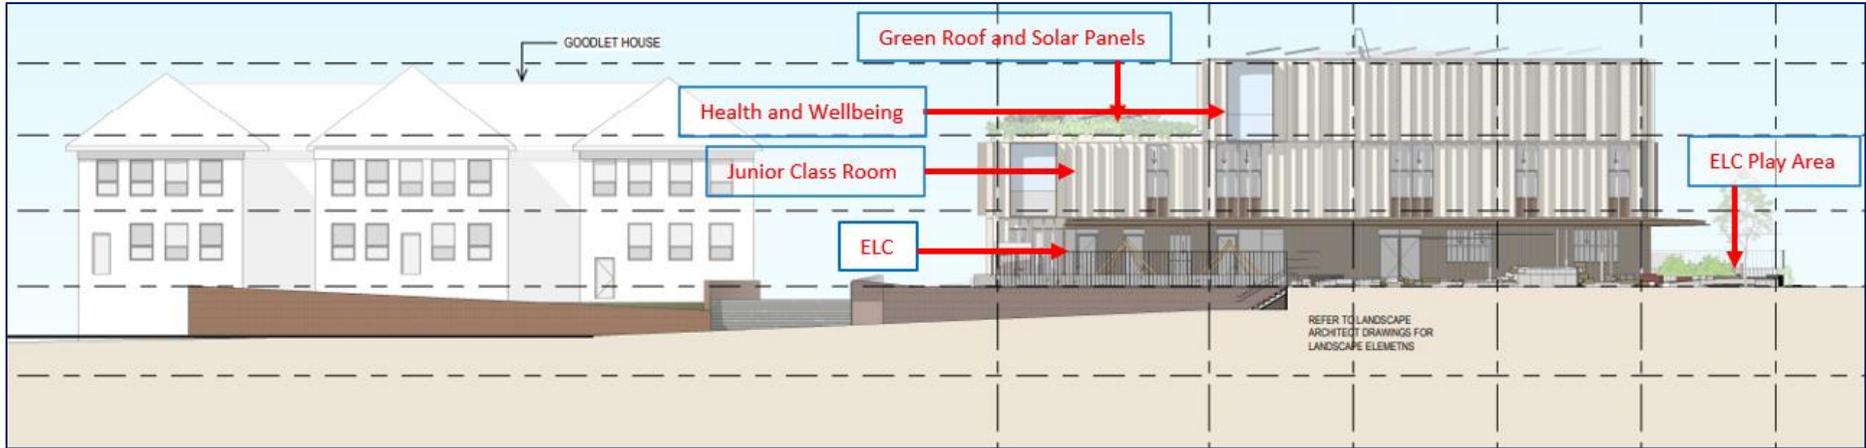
| South-west elevation of the proposed building (Source: Applicant's RtS 2022)
